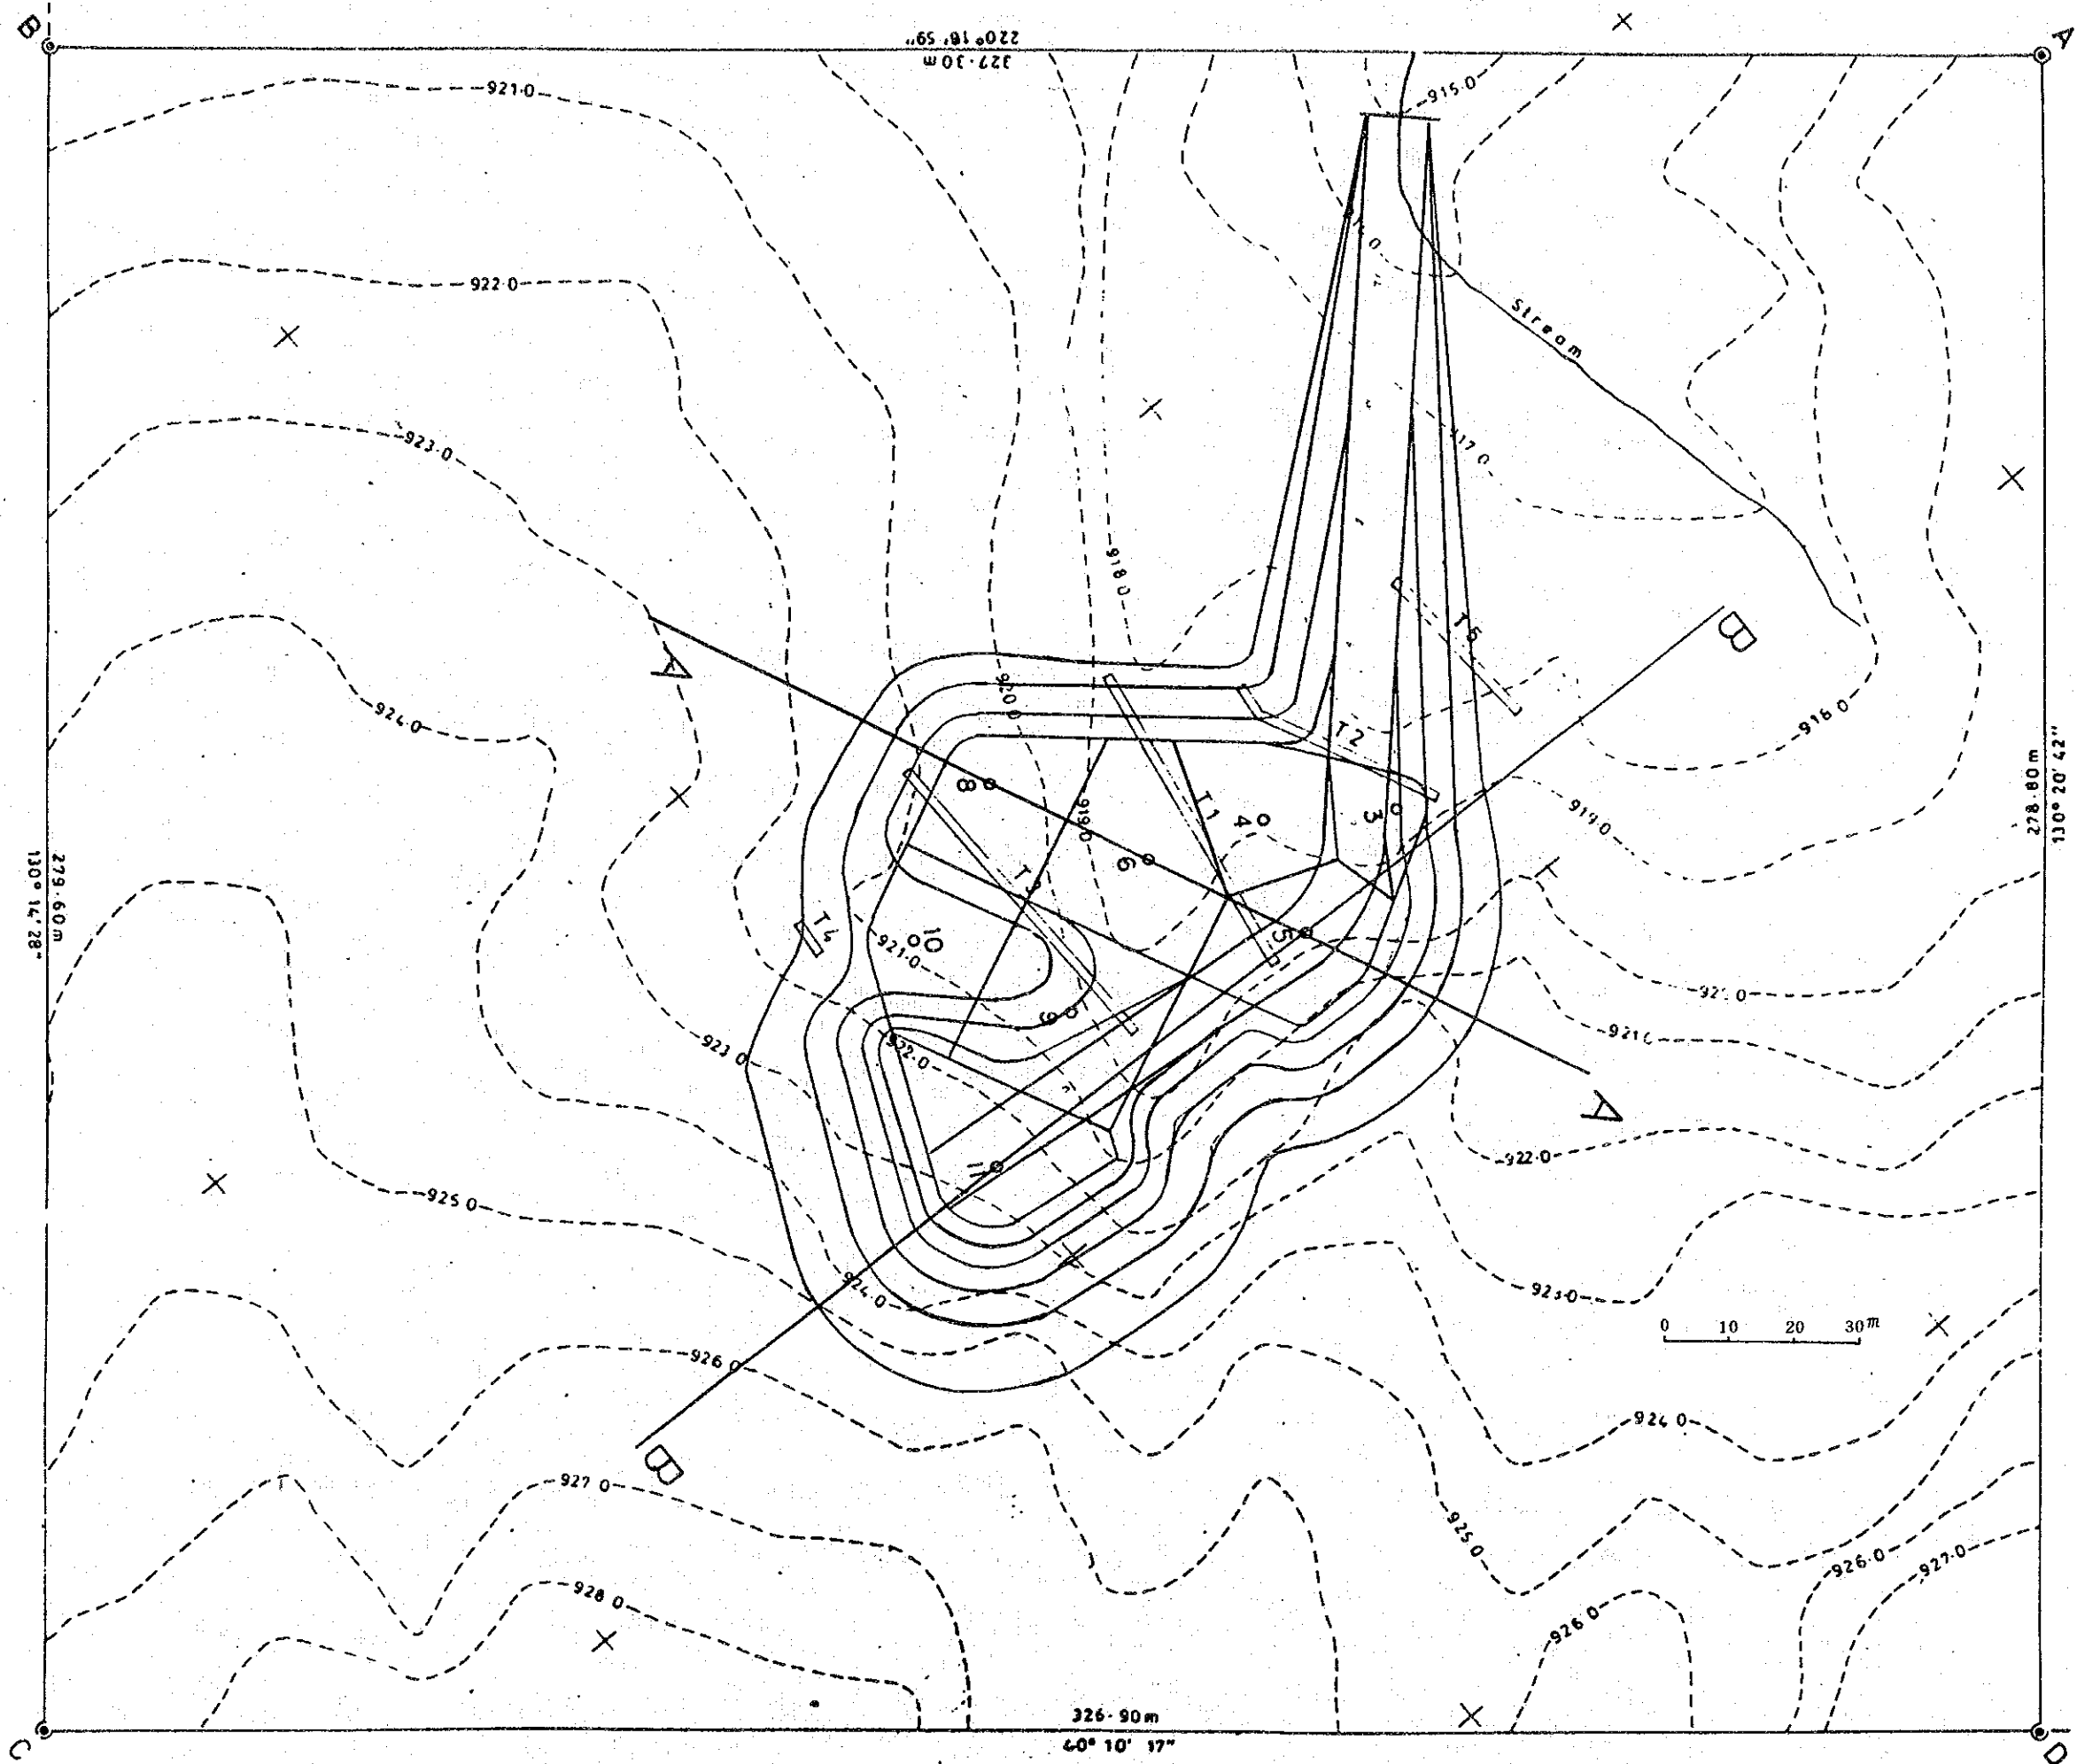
Final Pit Design for No. 4 Shallow Orebody. (1)
